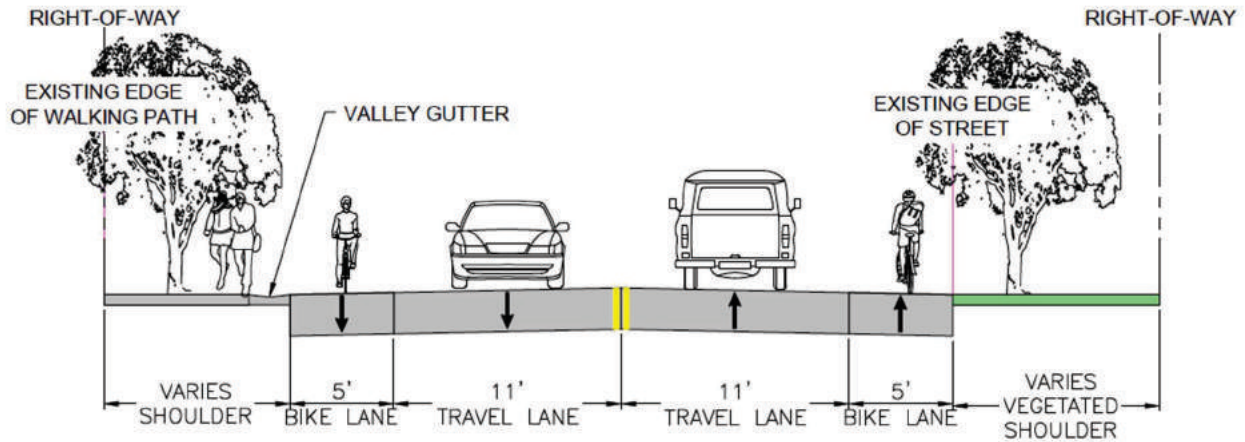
Ringwood Avenue Existing Cross Section (Menlo Oaks) Looking North Toward Bay Road
